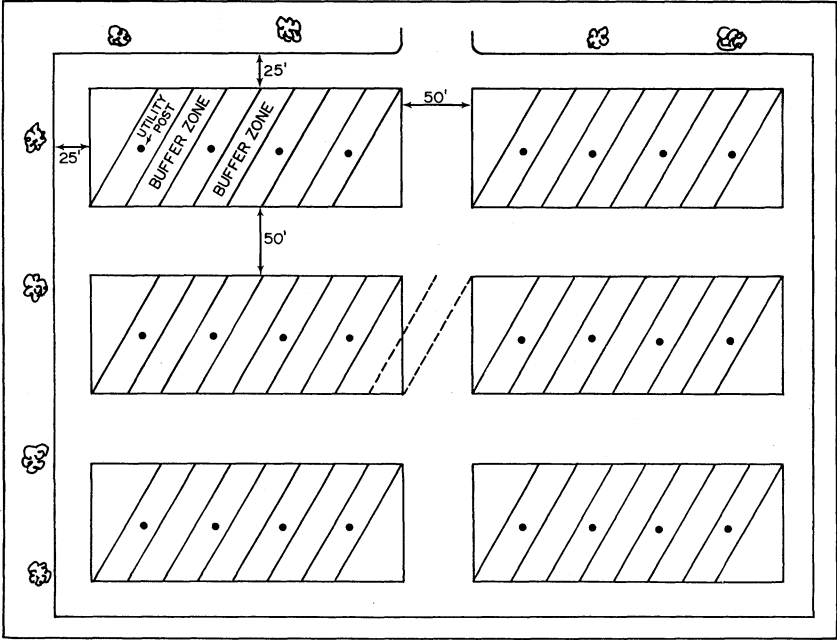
Campground layout illustrating roads, sites, and possible expansion.
